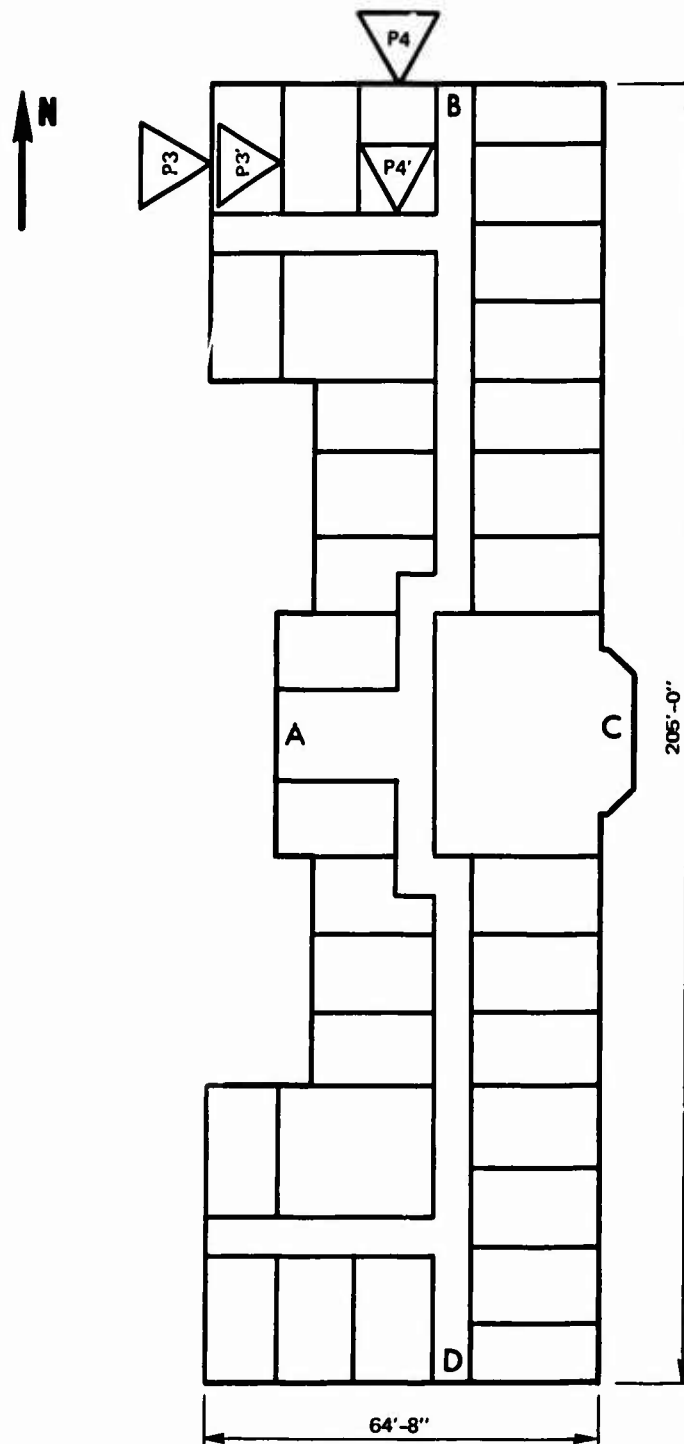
PLAN VIEW OF INTERIOR WALLS ON SECOND STORY
